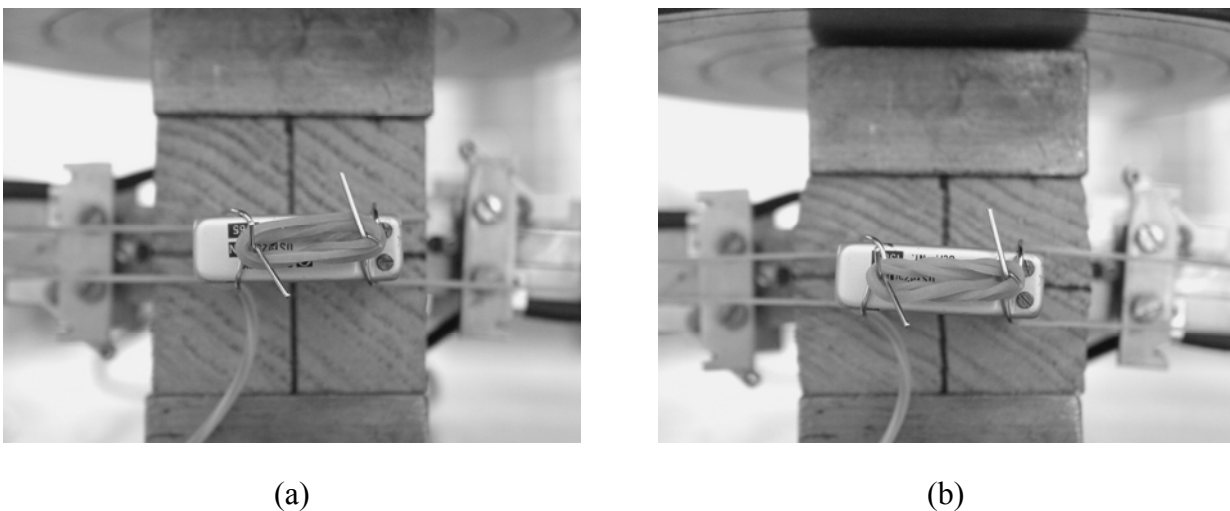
Typical diagonal behaviour: (a) unloaded test specimen, and (b) test specimen at failure.
